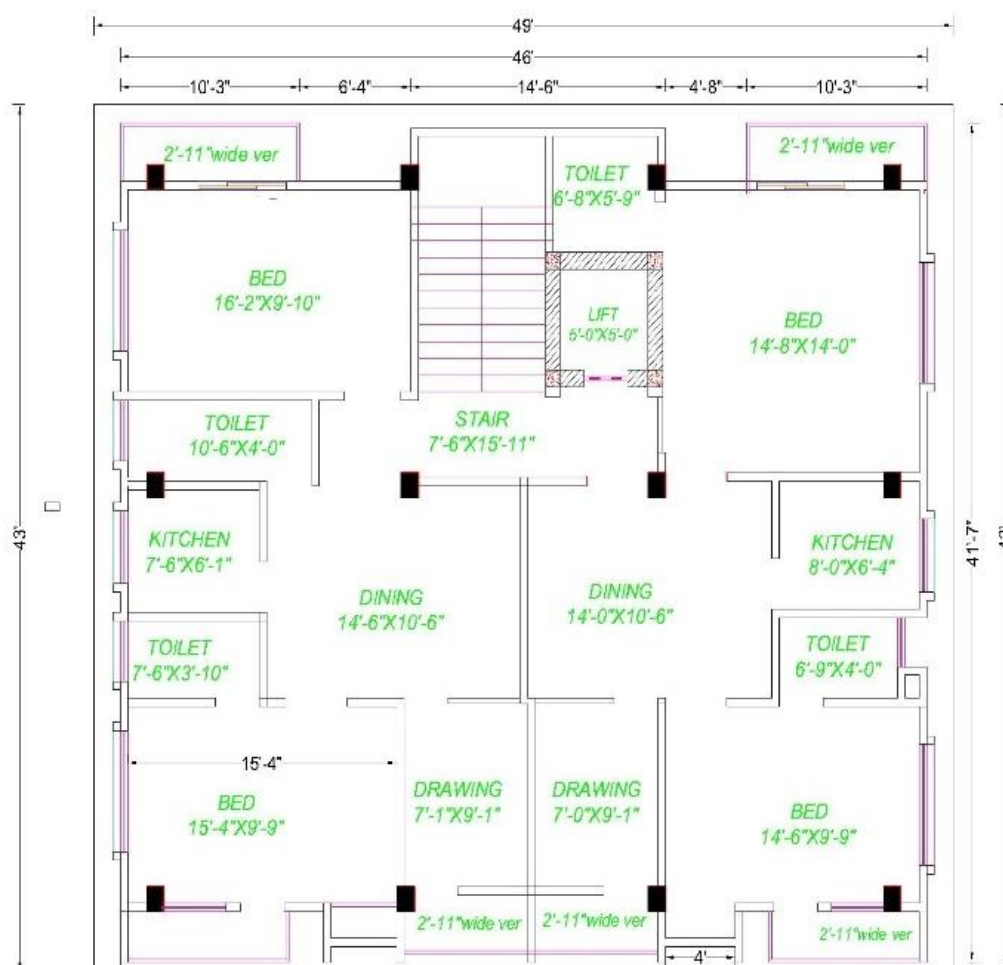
Layout of plan of Flat slab and conventional RC framed structures.
